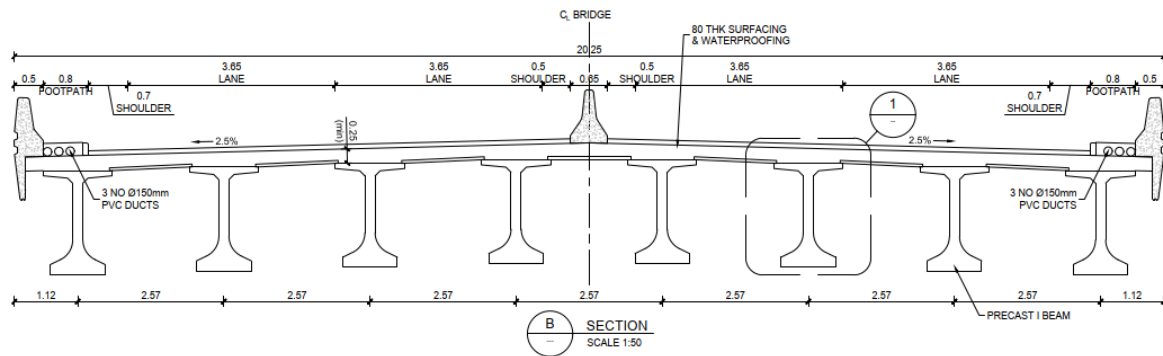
Typical cross section (Precast I-beams) for accessing spans.
